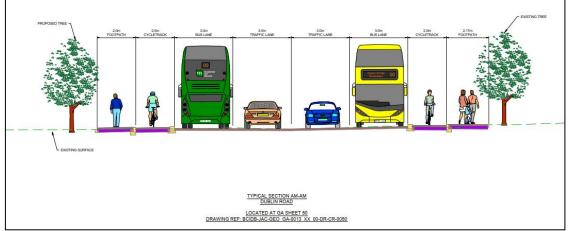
Extract from Typical Cross-section Drawing (Sheet 50)
